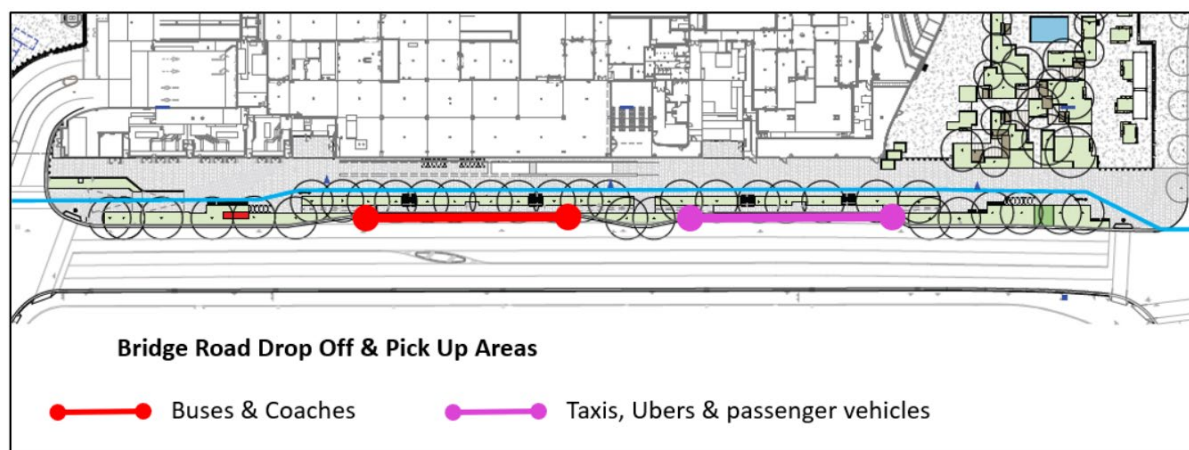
Bridge Road Bus Drop Off and Pick up Areas
